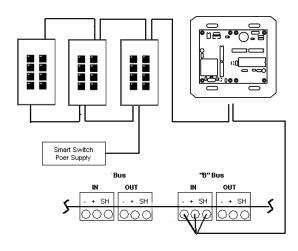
Detail of Smart Switch Terminal Connection to the MCP Network
